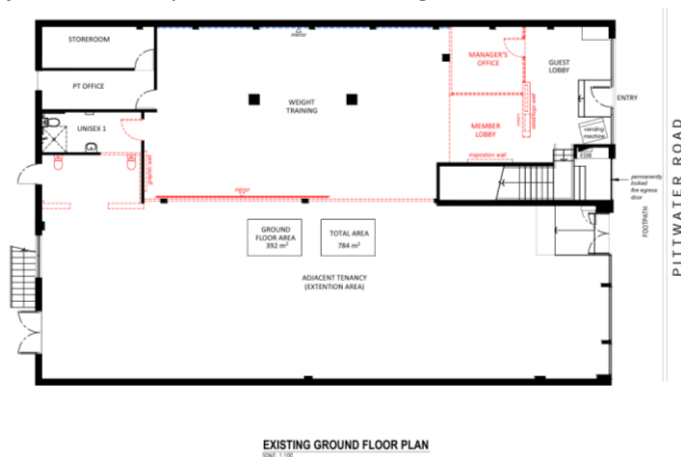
Floor plan showing the adjacent tenancy extension area (from Archispectrum)
